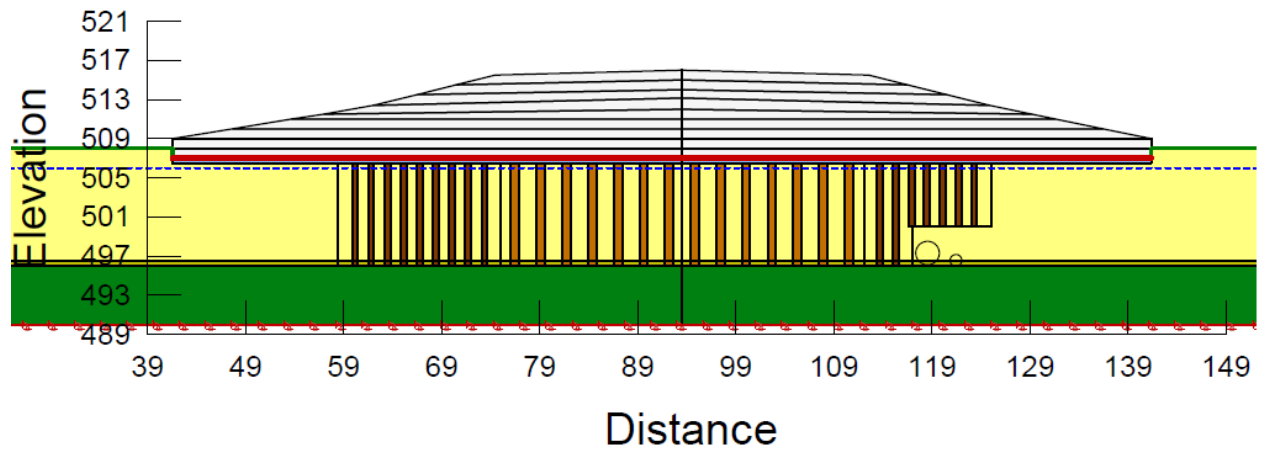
FEM North Abutment Cross-Section Model Insitu
